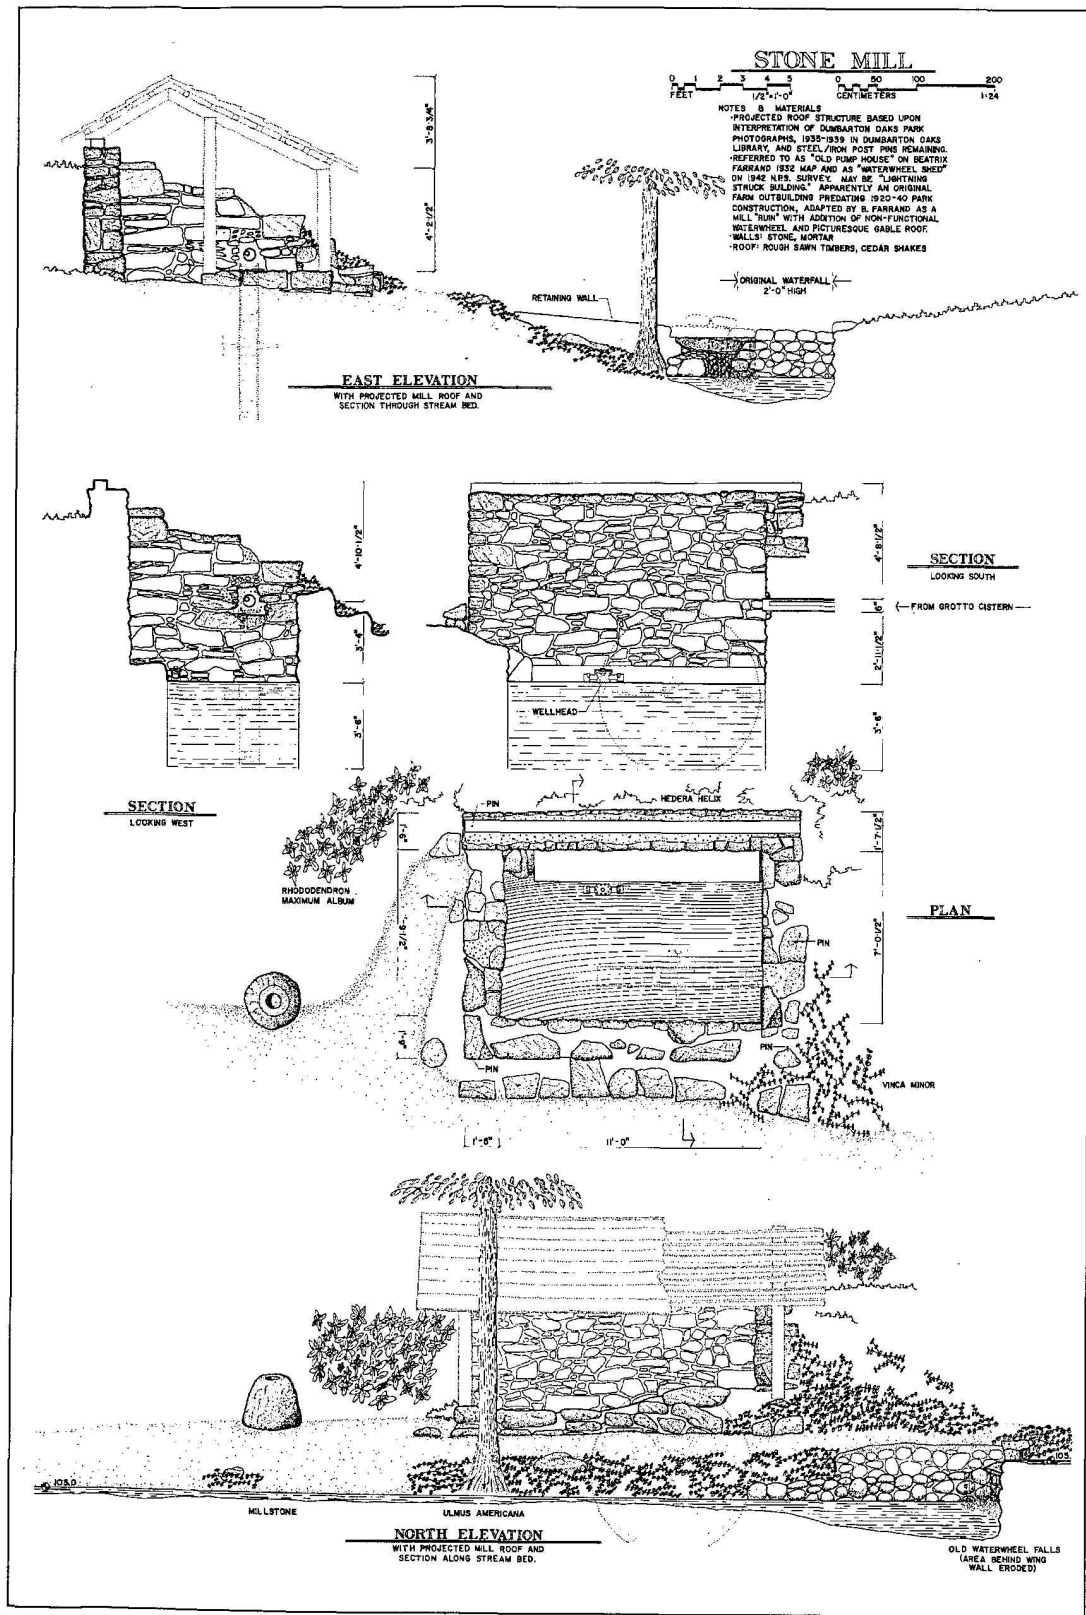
Detail drawing of the Old Pump House (HABS called it the Stone Mill). HABS, Summer 1989. NCR, Plans and Drawings Collection, #863/80015 (Sheet 22 of 28)
